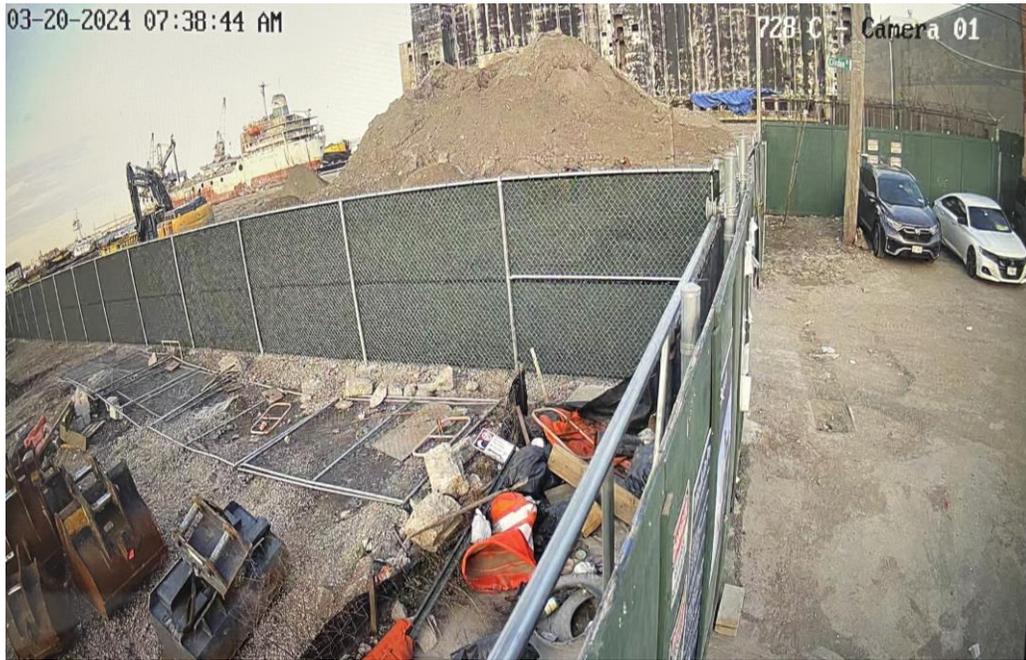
Stockpile conditions prior to import, facing west. Morning of 03/20/2024.
